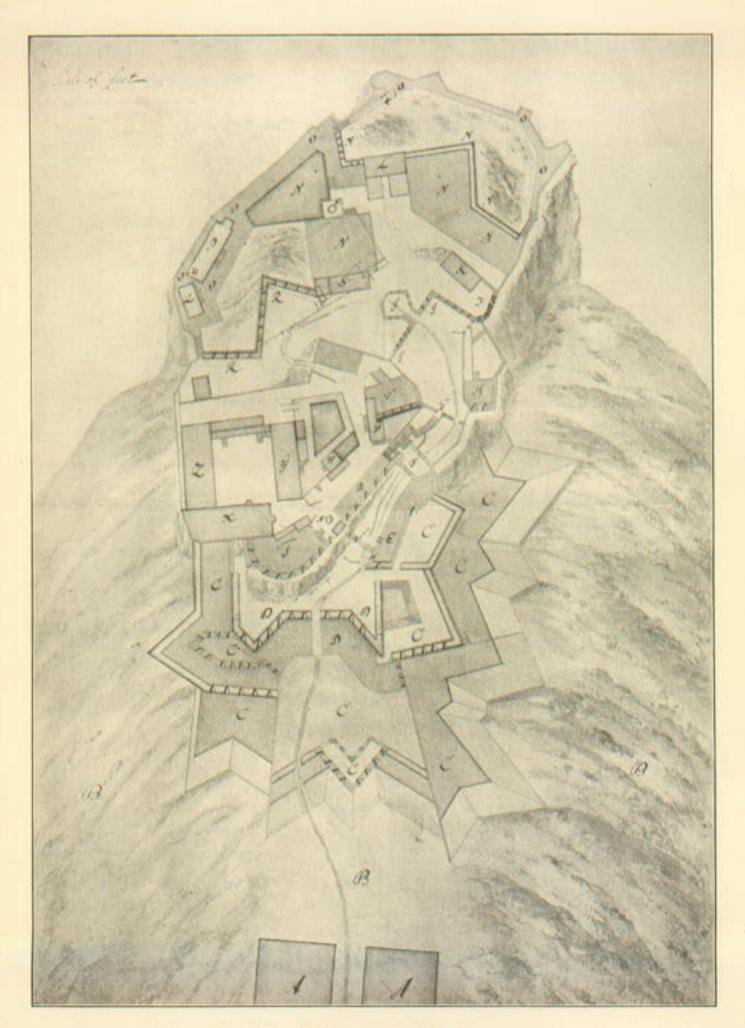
Plan of Edinburgh Castle by Slezer, 1675.
